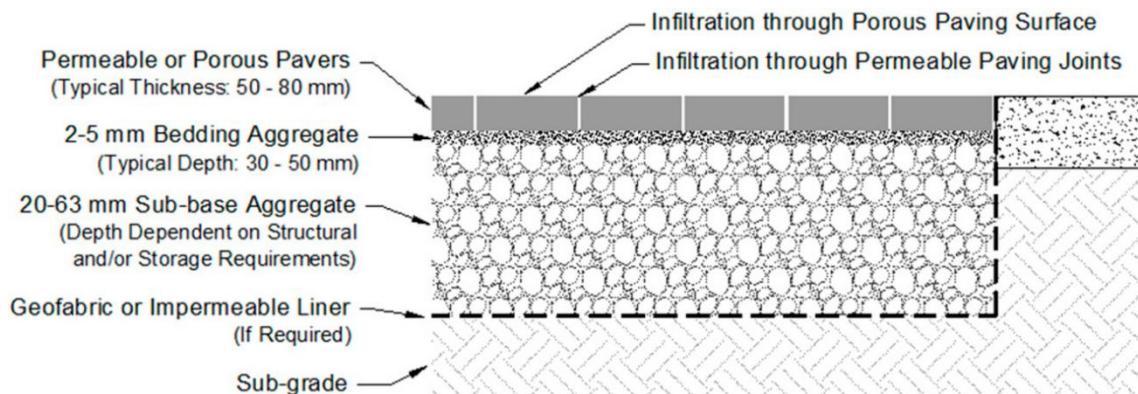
Typical structure of a permeable pavement system (Scholz and Grabowiecki, 2007)
